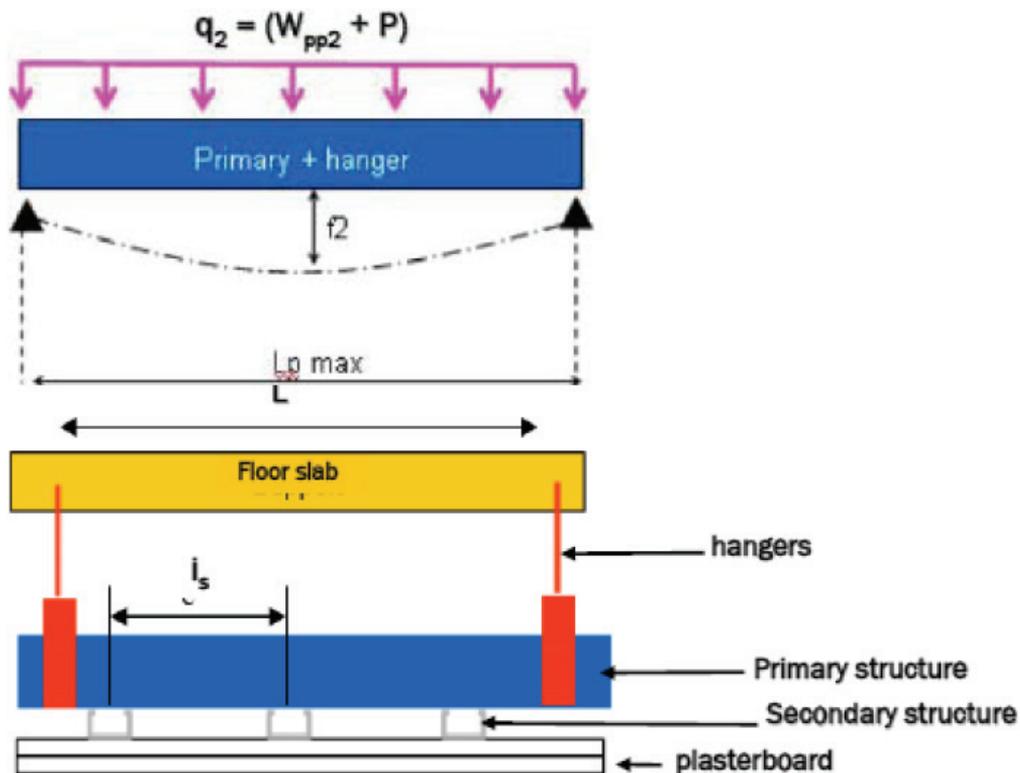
Scheme of double frame ceiling: primary structure and hangers.
